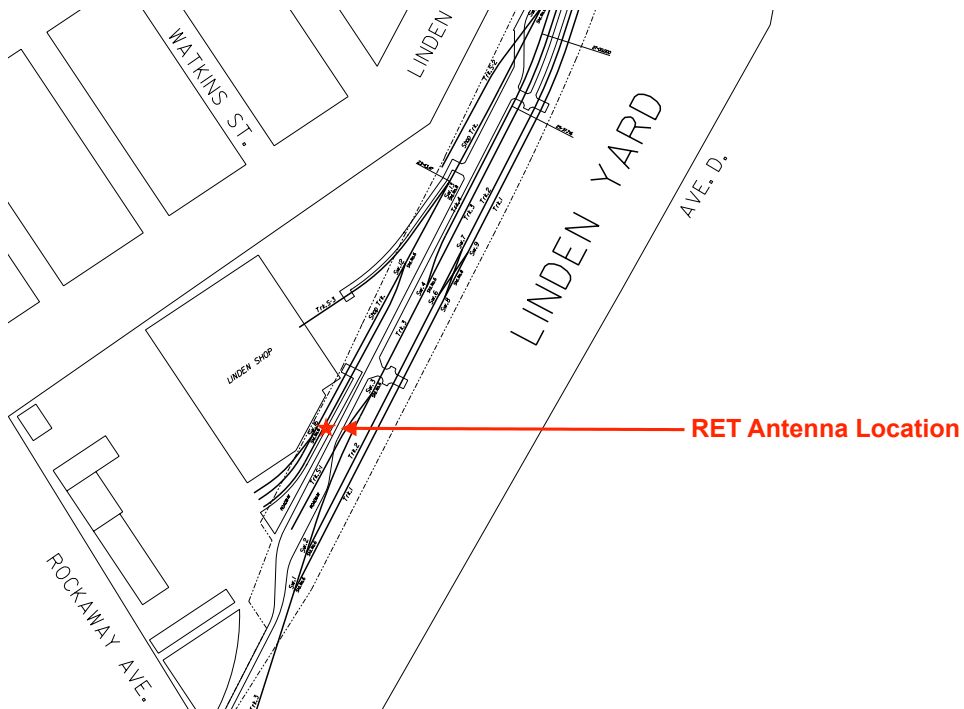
shows a map of the Linden Yard facility and Figure 4-2 shows the potential RET test location. Figure 4-3 shows a picture of the Linden Yard Test Track.
